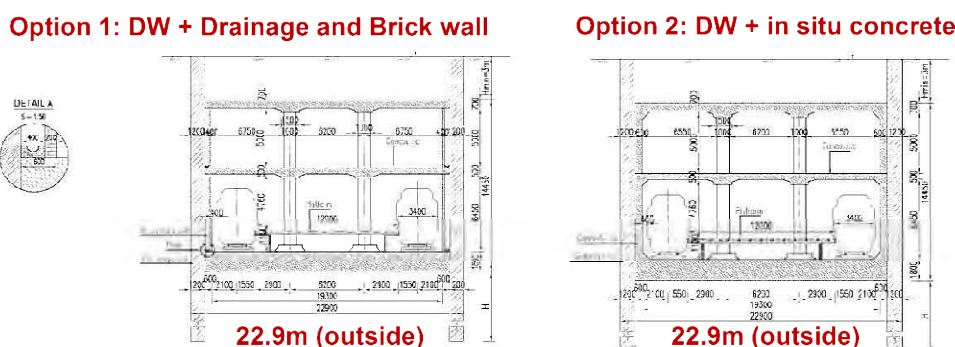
Arrangement of Diaphragm Wall in This Study
